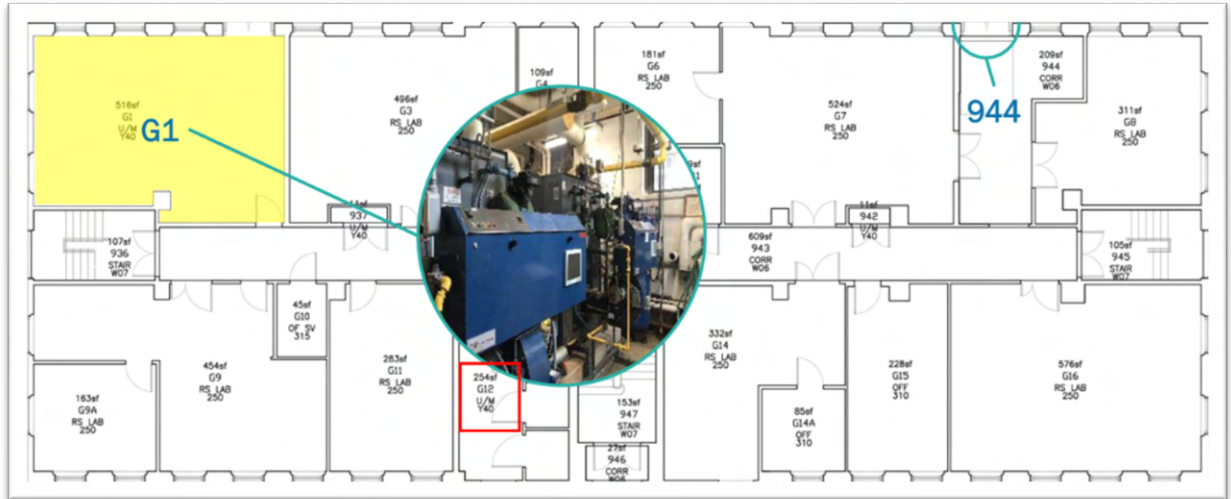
Floorplan of Bigelow with highlighted in yellow vulnerable room G12, circled in blue is door 944, and room G12 outlined in red.
